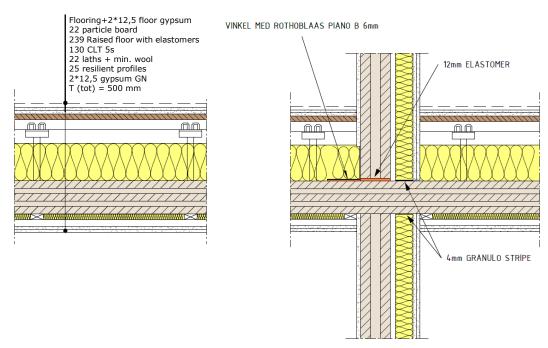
Floor structure, partition wall and junctions in BRF Gourmet.
